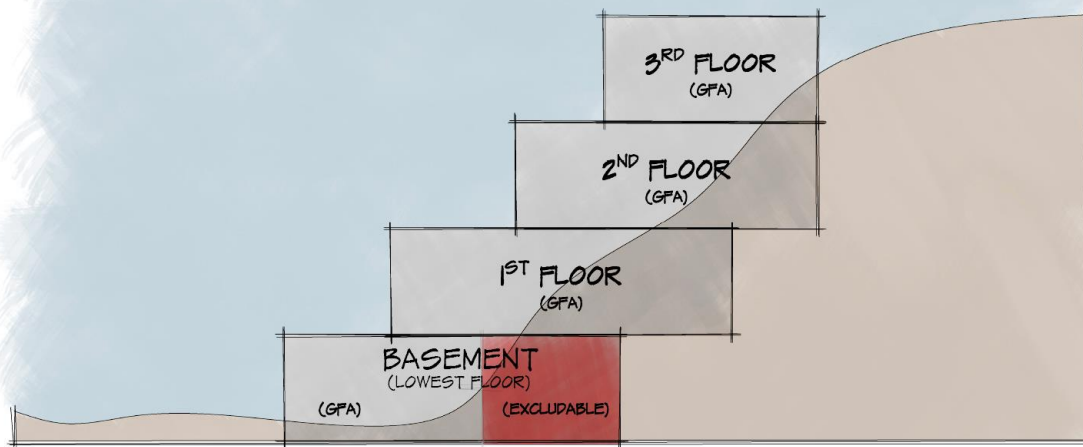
For a sloping lot with a stepped building, only the portion of the lowest floor (basement) where at least 50% of the exterior wall height is below the level of finished ground adjoining the wall is eligible to be excluded as in-ground basement floor area.
